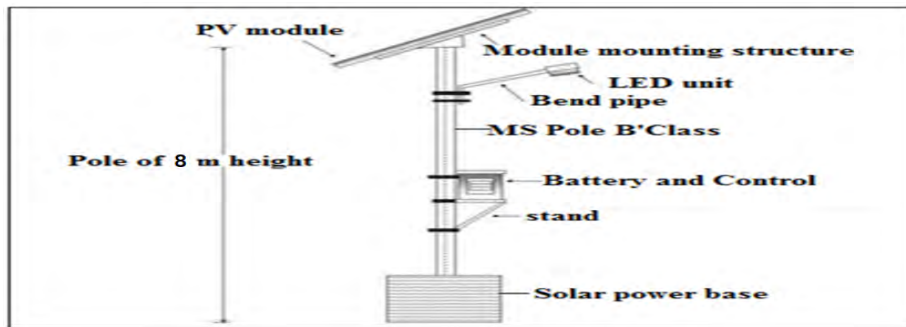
Shows pole mounted installation of solar based streetlight system
